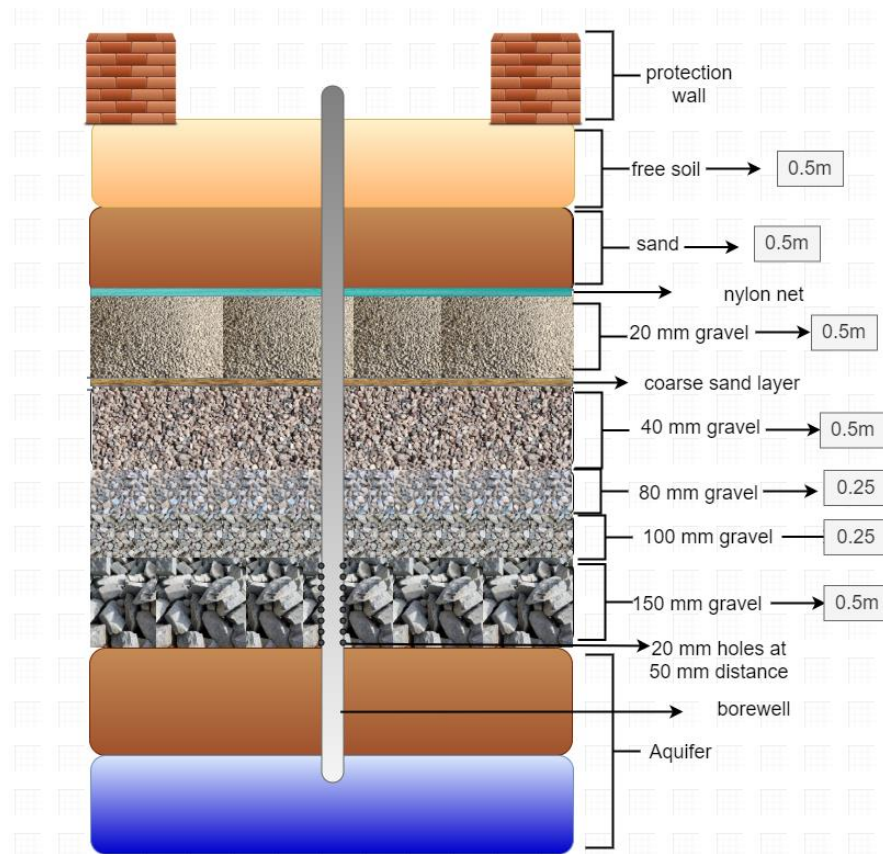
Detailed cross-section sketch of a filtration system for recharging in-use borewell
